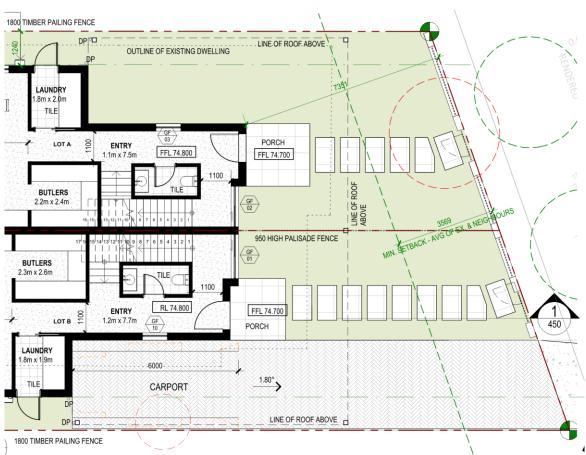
Plan detailing the location of carport and western roof line that does not comply with the BCA for fire safety.
